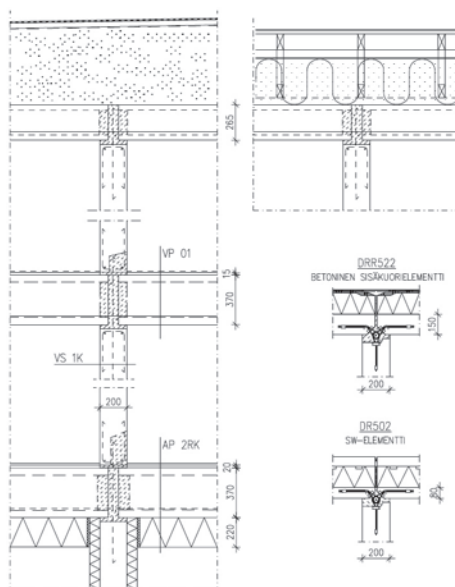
Details of typical separating floor. [[2] - (Finland)].
